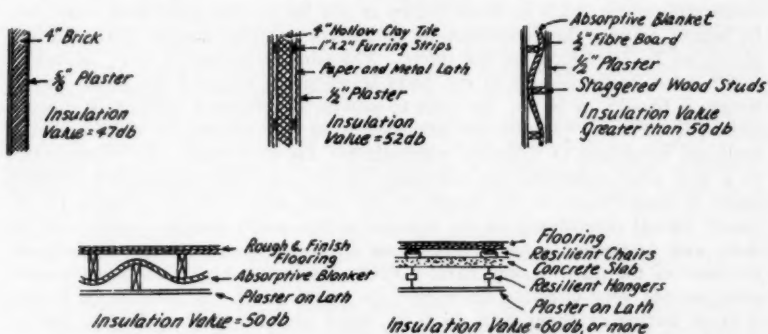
THREE WALL SECTIONS AND TWO FLOOR AND CEILING SECTIONS WHICH WILL PROVIDE A SOUND-INSULATION OF MORE THAN 45 db.
